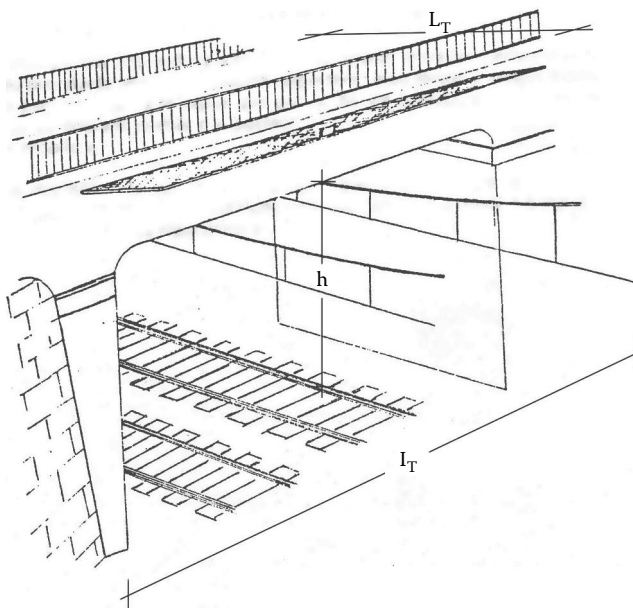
Passage of an electrified railway track under a road bridge – height clearance h , civil engineering structure width L_T , and civil engineering structure length I_T . (Figure based on SNCF 1984, *Ligne aérienne de traction électrique en courant alternatif monophasé 25 KV–50 Hz*, Internal document, Paris.)
